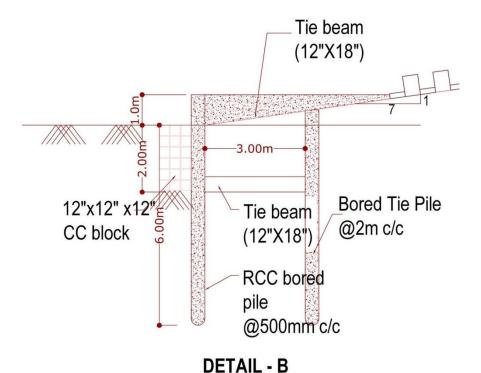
Detail of Dike at EZ Side
